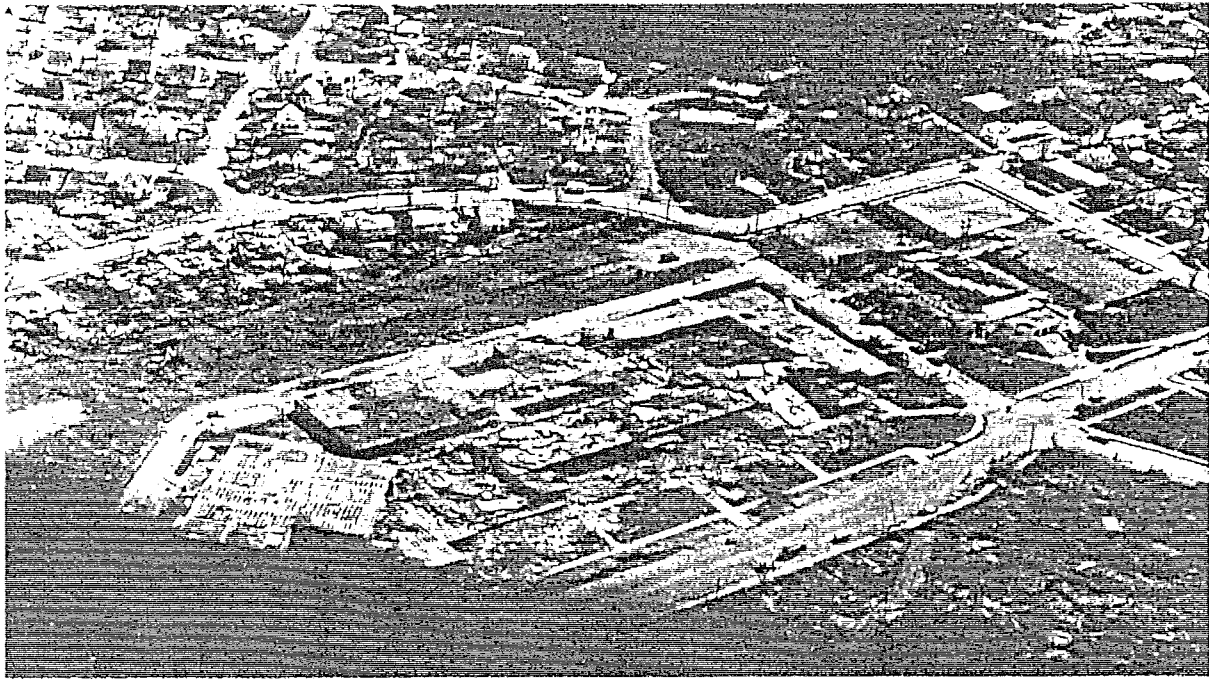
XENIA HIGH SCHOOL. Aerial view shows extensive damage to the school building and to the surrounding area. Tornado traveled from bottom right corner to top left corner of the photograph.
